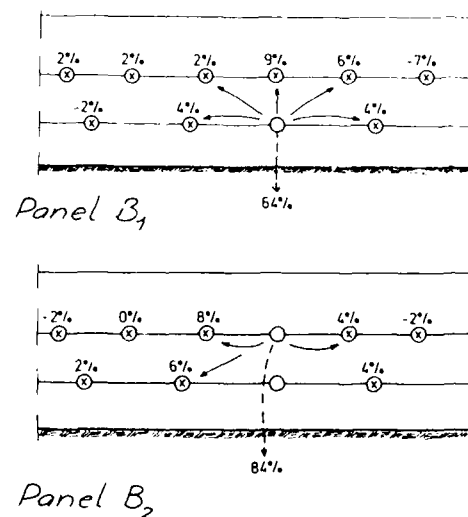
Load redistribution at Mölntorp, Sweden at failure of one or two ground anchors (after Stille, 1976)
